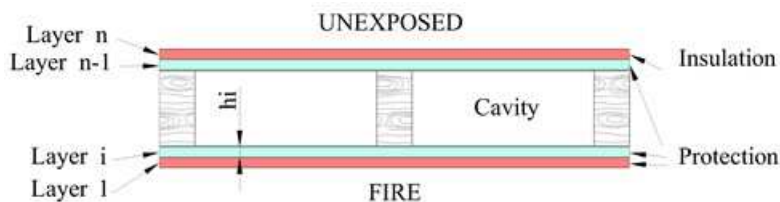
Timber framed wall with basic layers for protection and insulation
